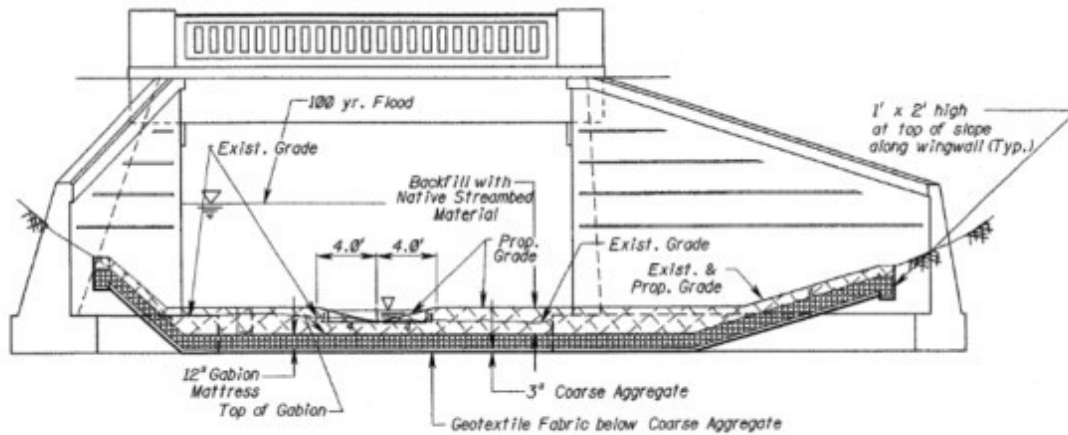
Gabion Detail at Embankment: Upstream Elevation, Looking Downstream.
